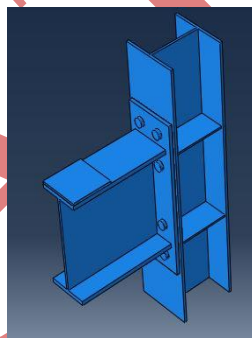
Extended endplate with 4-Bolt row, M20 bolt and Column stiffener
